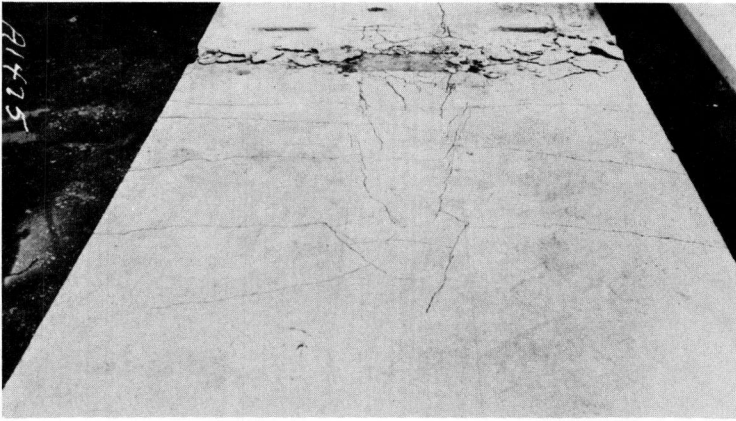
Slab-cracking pattern, composite shear test, pretensioned beam.
